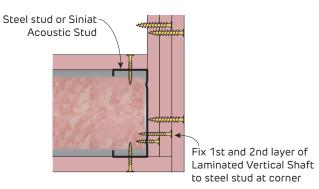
Laminated Vertical Shaft Corner Transition to Steel Framed Partition Wall Plan view
